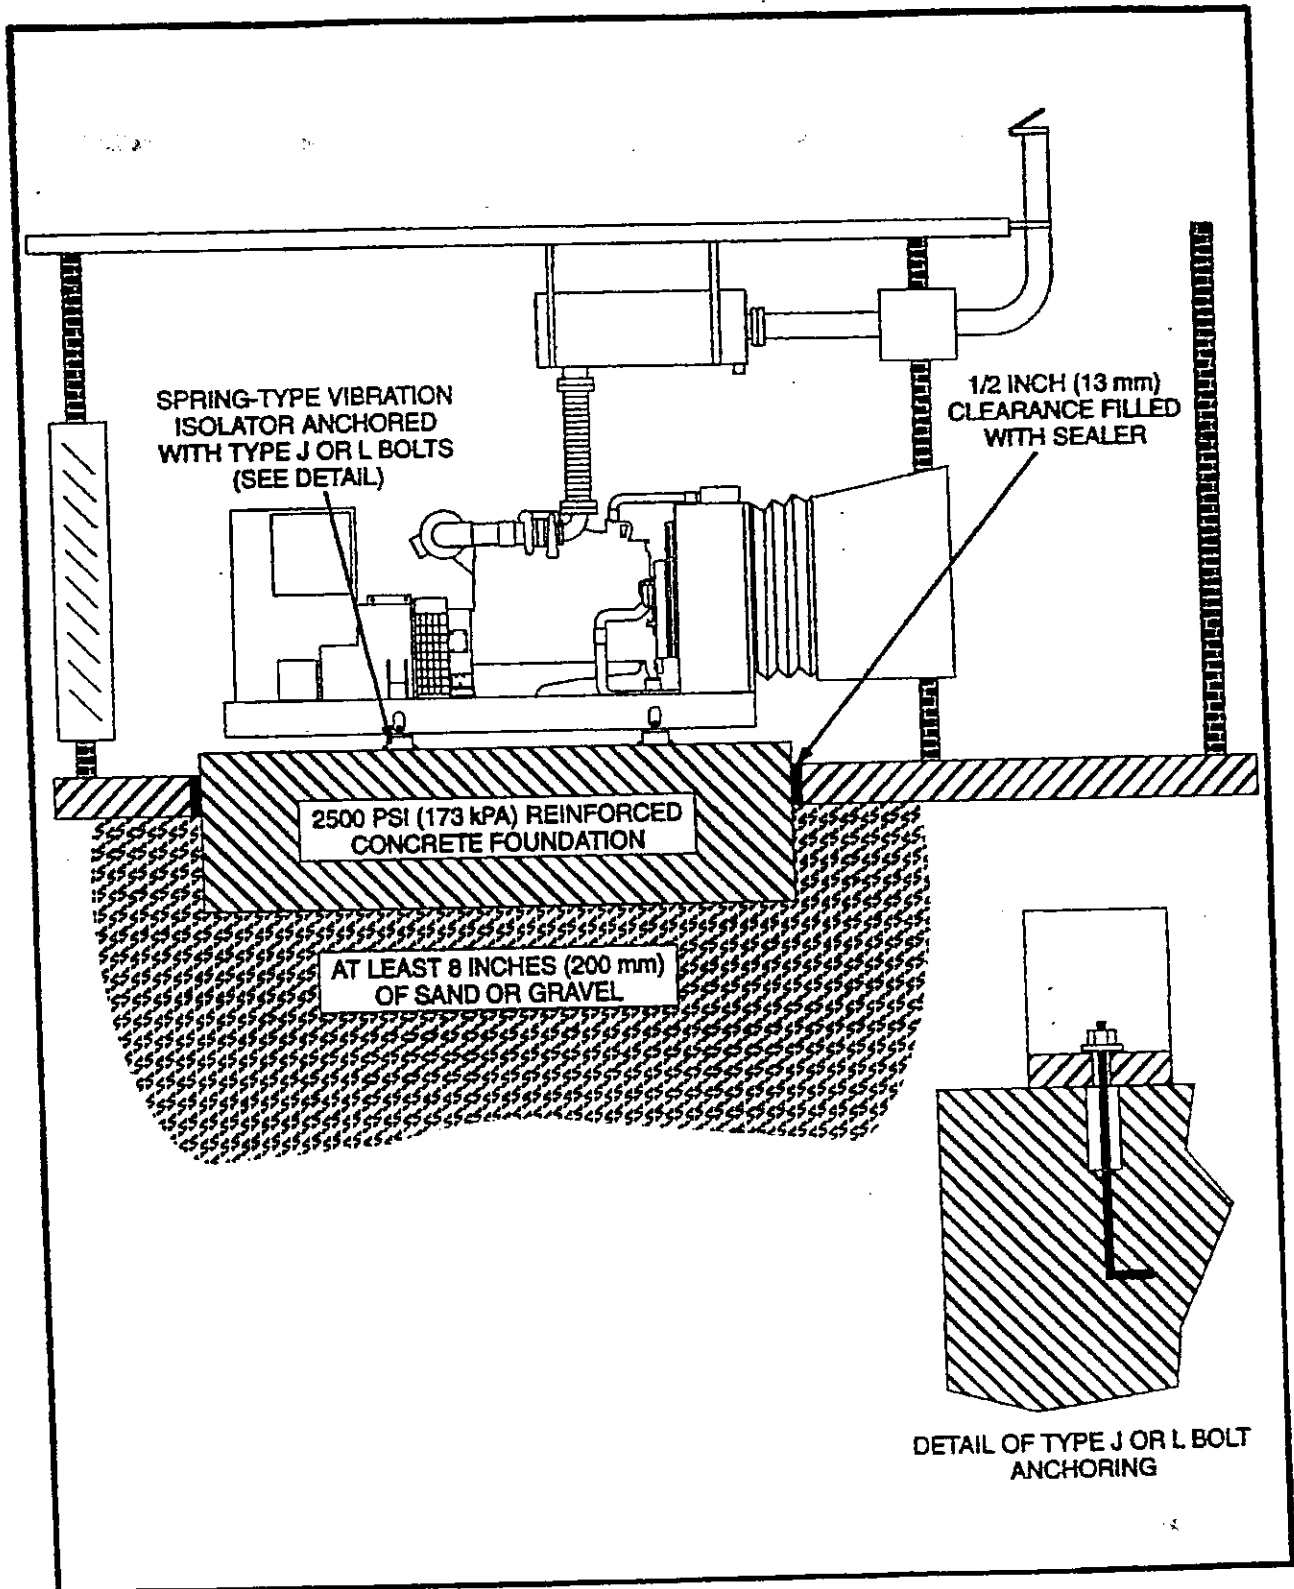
TYPICAL VIBRATION ISOLATING FOUNDATION
